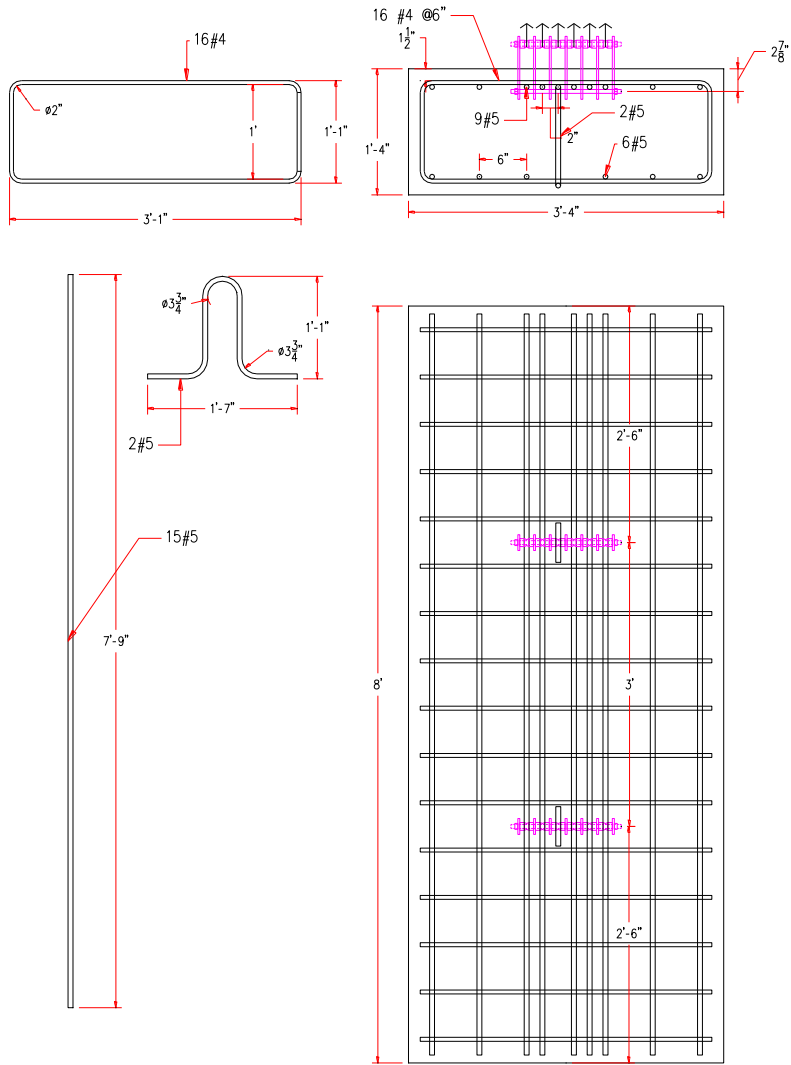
Dimensions and reinforcement details of the revised specimen
